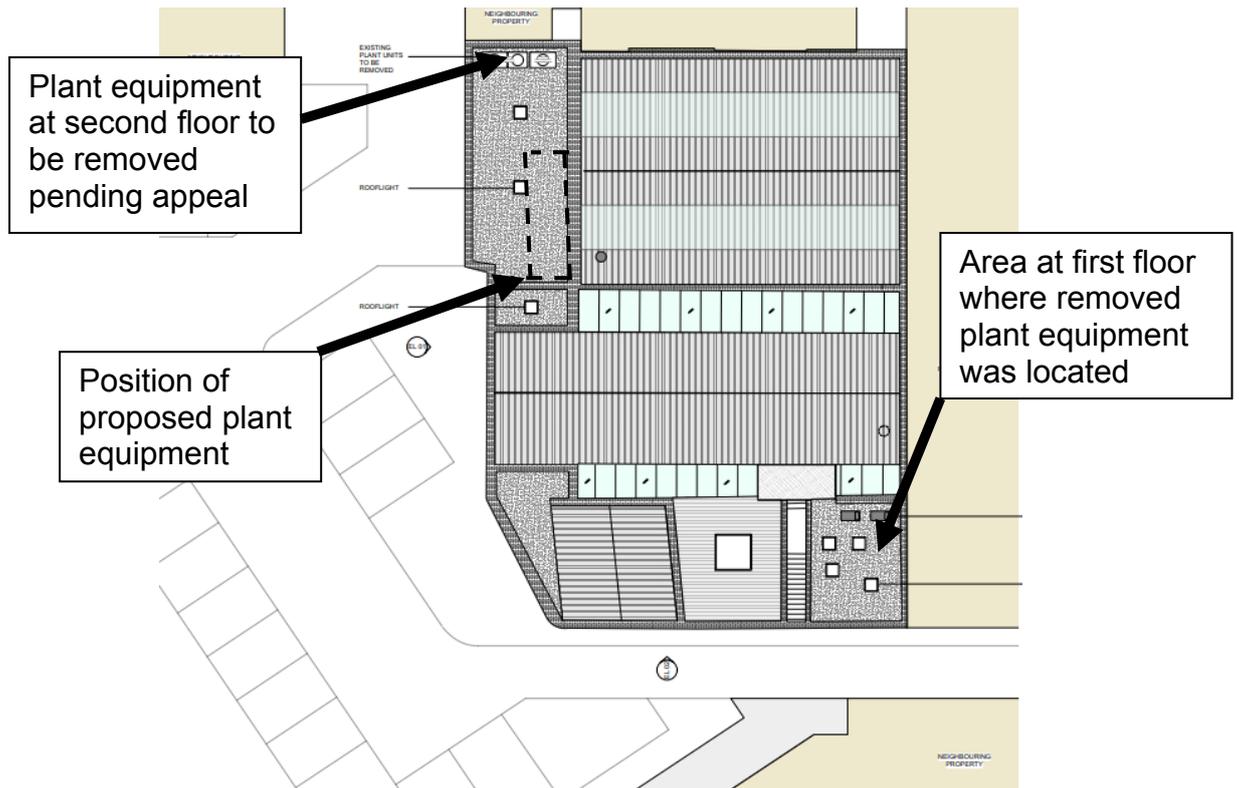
Existing Roof Plan showing position of existing plant at second floor to be removed and the area of the removed plant equipment at first floor
